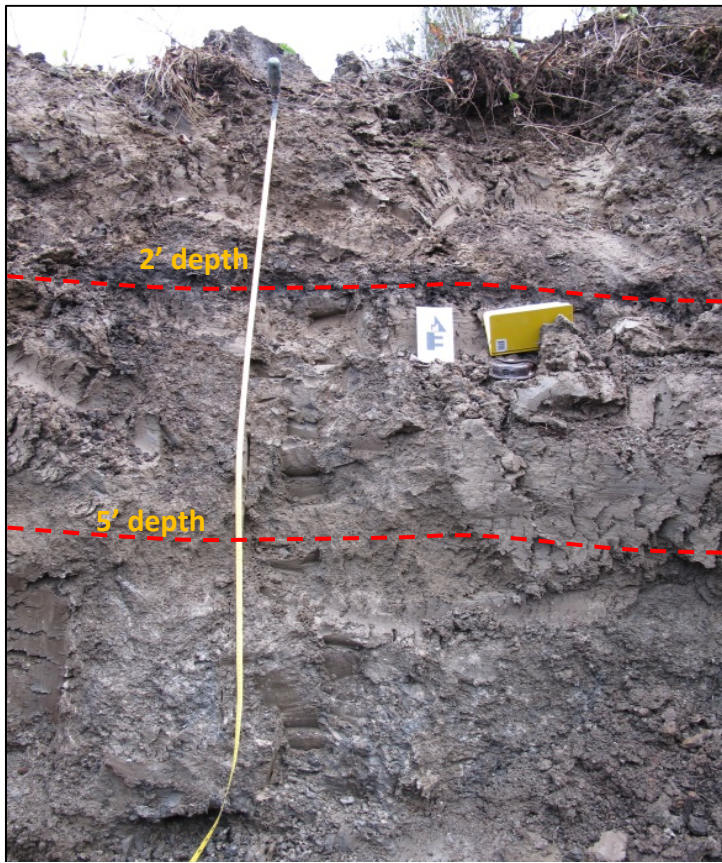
Soil profile from Test Pit 2 in Block Dam No.2.
